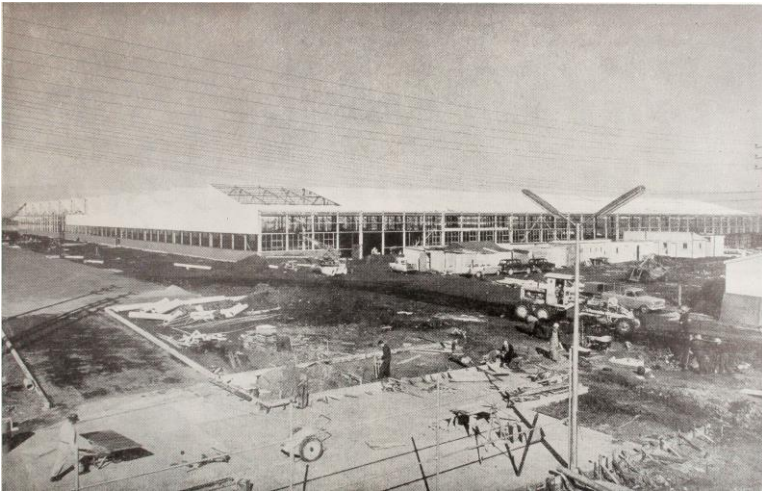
Plant No.10 under construction on reclaimed land, 1961 (*GMH People*, August 1961, p.3)
